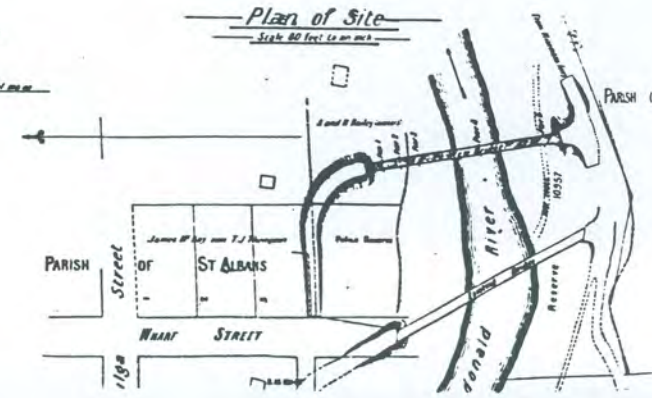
(b) Plan of the 1903 de Burgh composite truss bridge.
